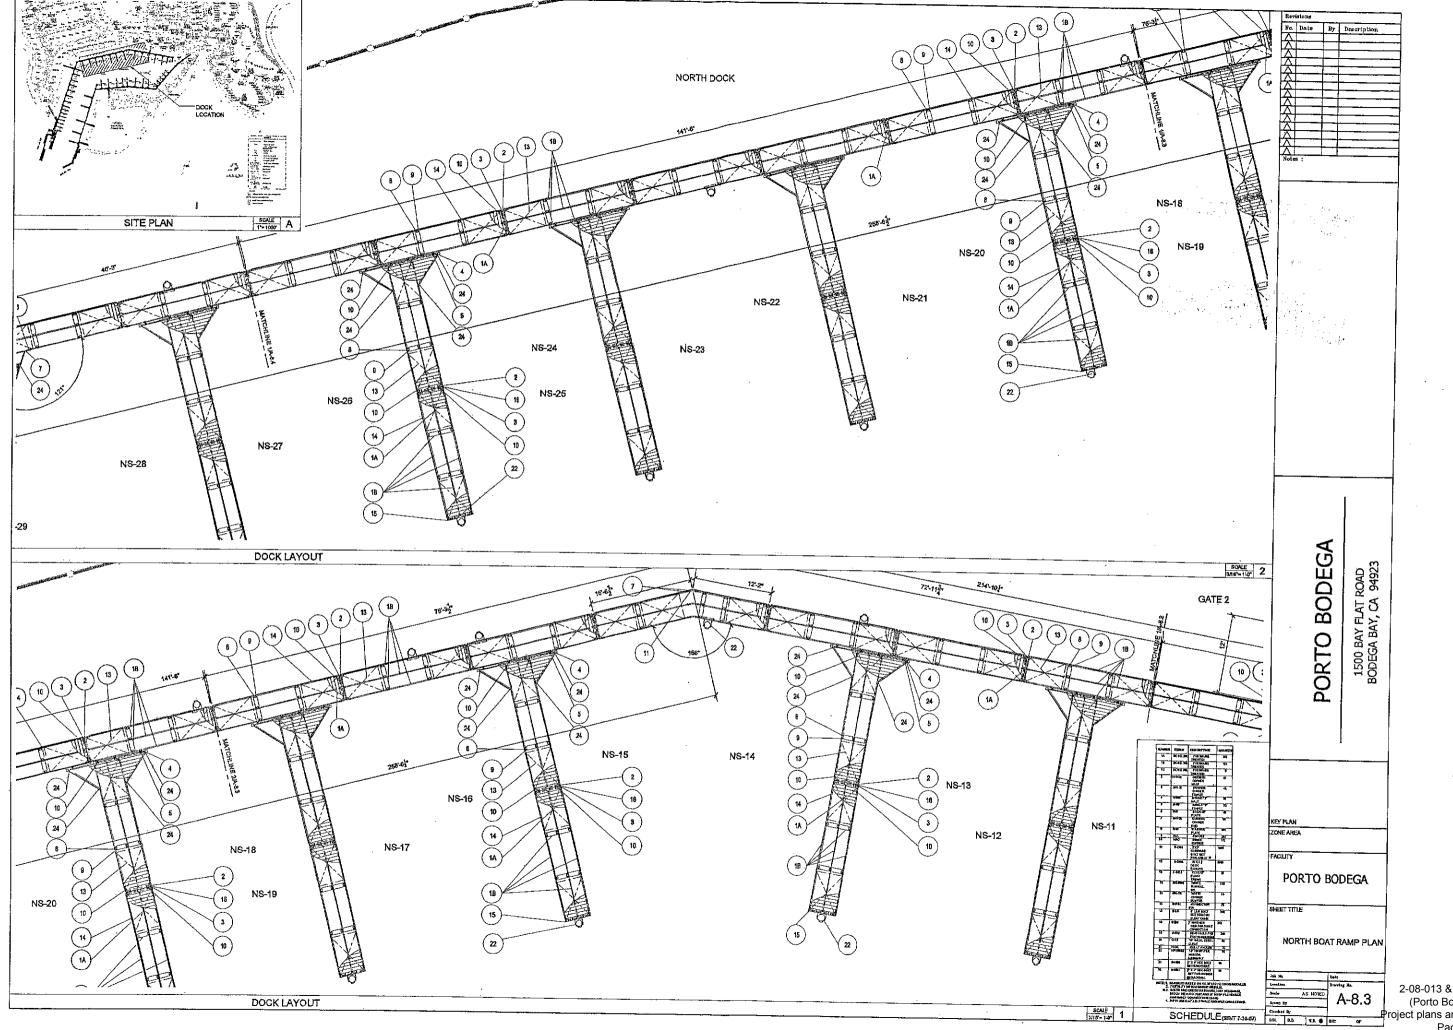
2-08-013 & 2-10-030 (Porto Bodega LP) roject plans and photos Page 5 of 14
